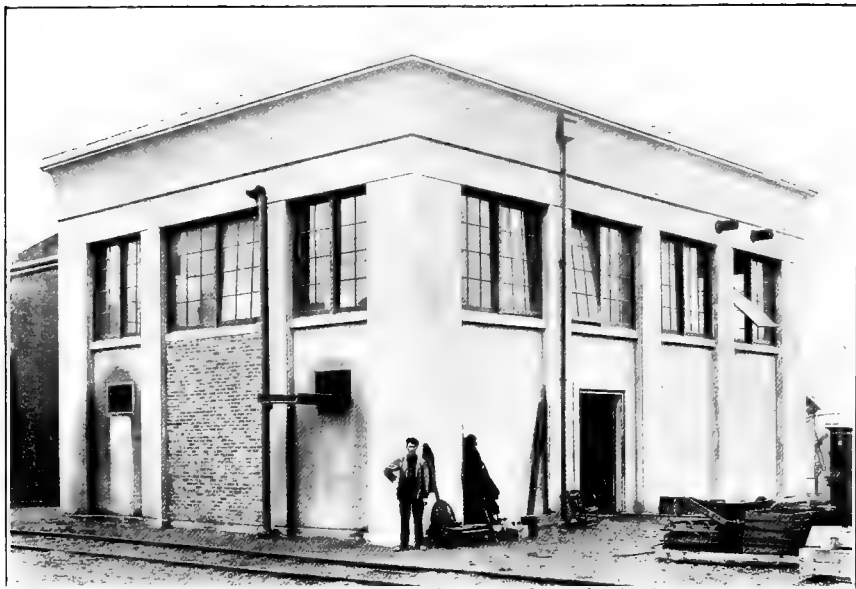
PORT MORRIS BOILER HOUSE, D., L. & W. R. R.
